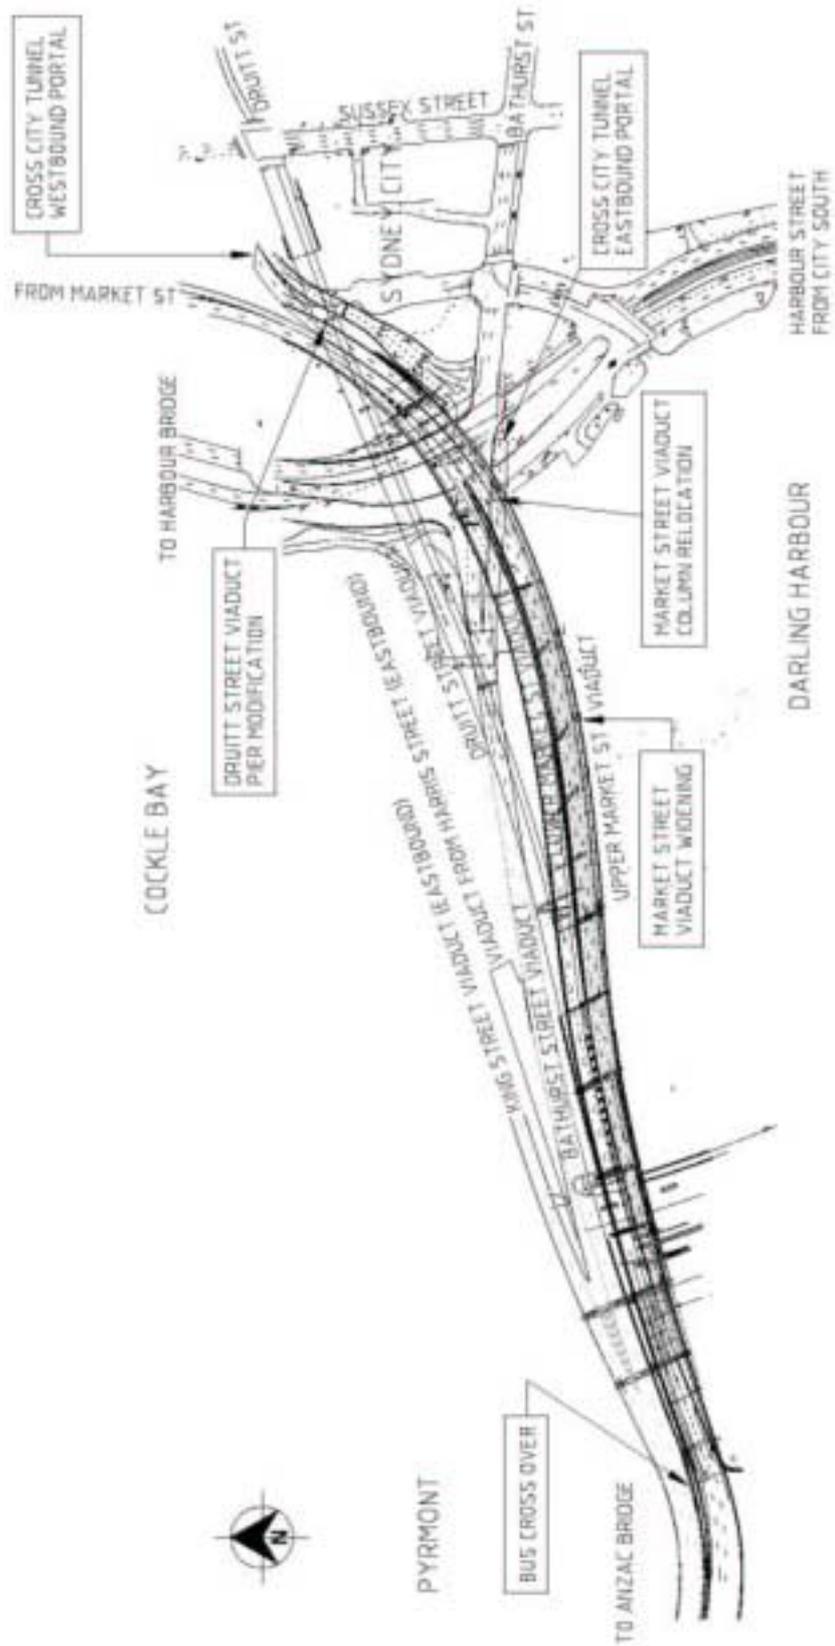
General Arrangement Plan – Western Distributor Viaducts
